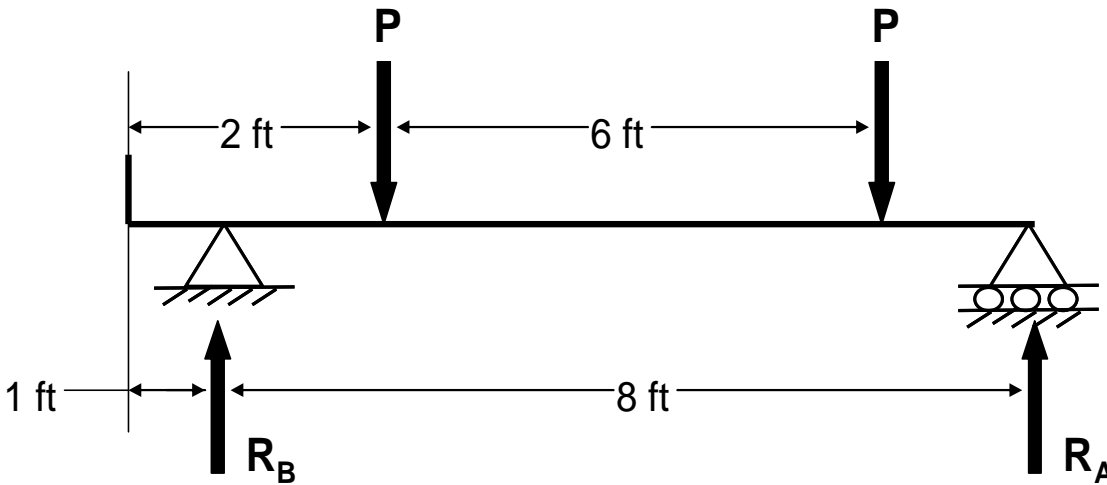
Exterior Girder Shear Distribution Factor
